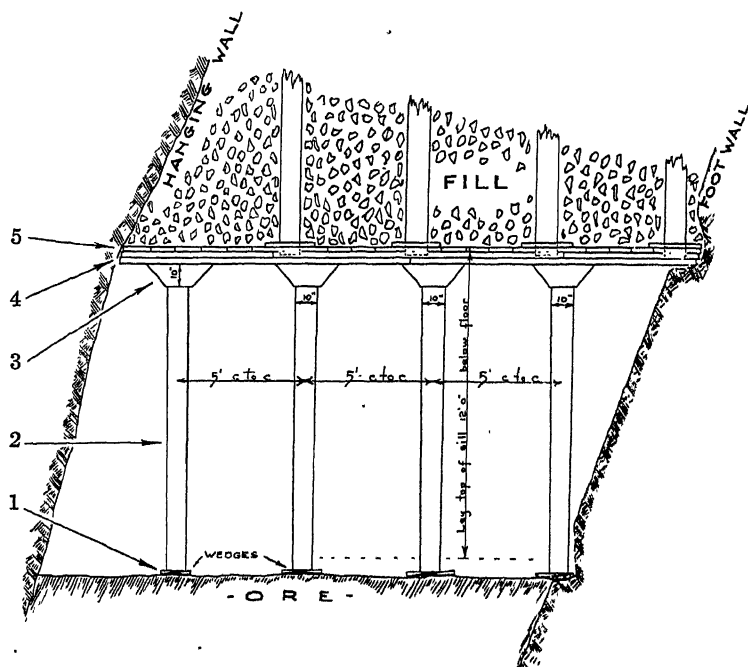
TIMBERING DETAILS. CROSS-SECTION OF STOPE.
